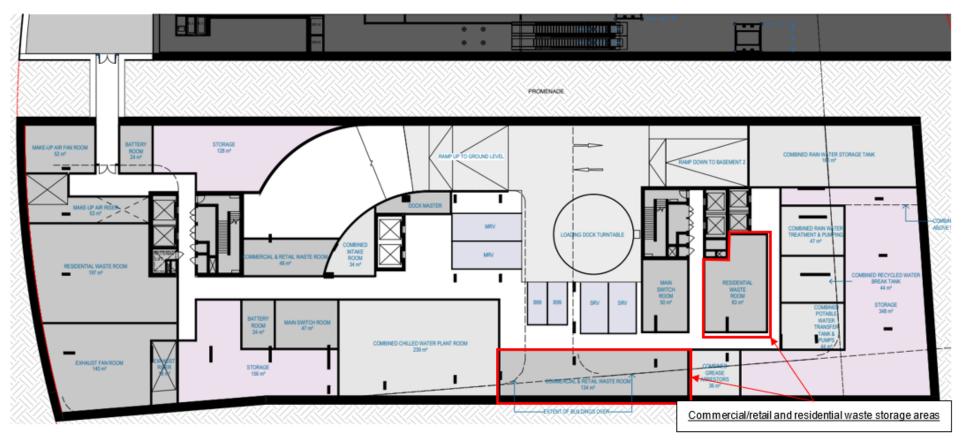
Building 2 Main waste storage room, basement level 1 design
